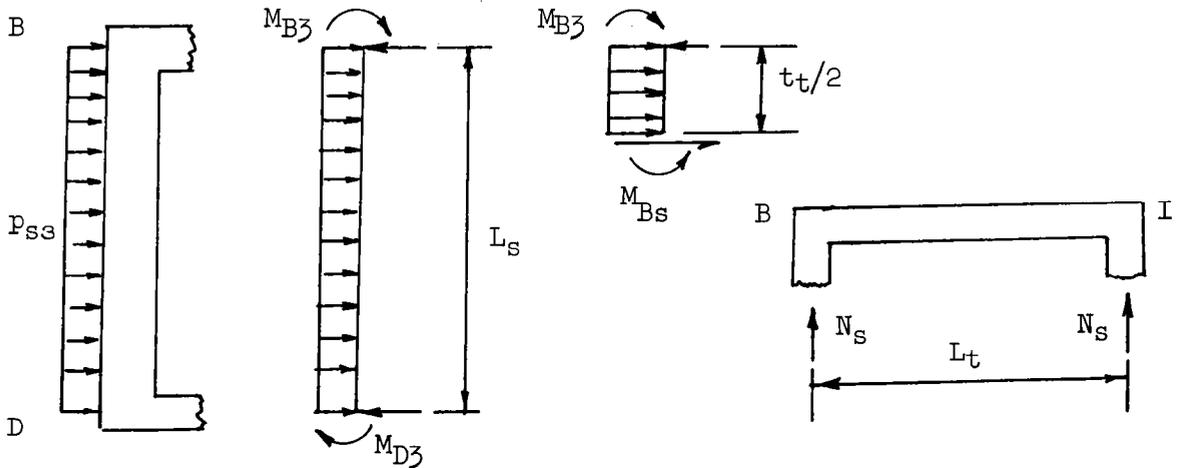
Moment and direct force in sidewall with loading B1-LC#3.
